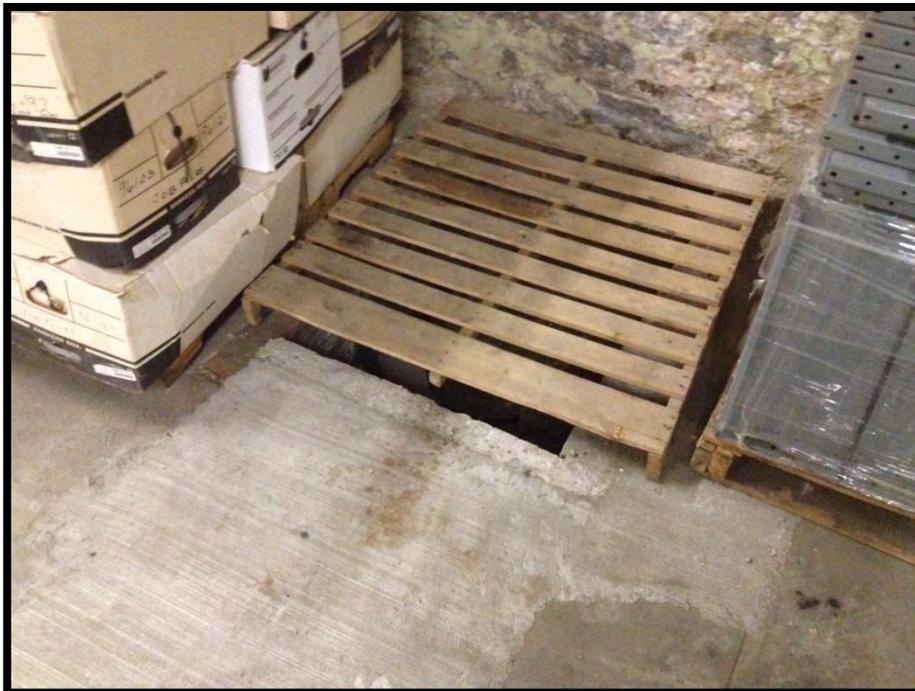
View of former pit located in basement of 2201 Spring Grove Avenue.
